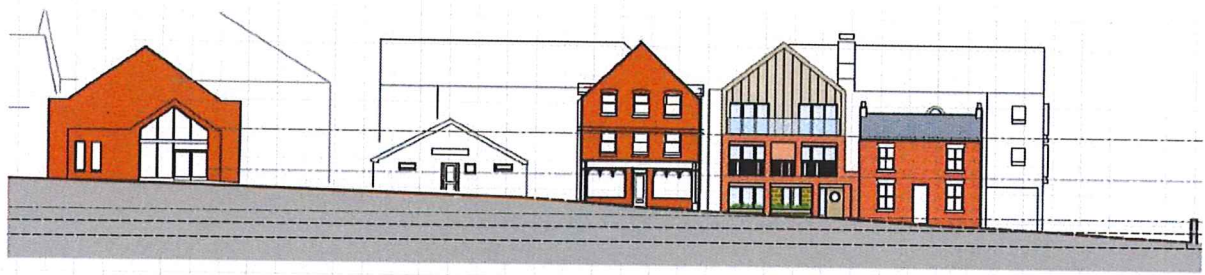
New Elevation amended to better mediate between the scale of Newmarket House and Gavel House
